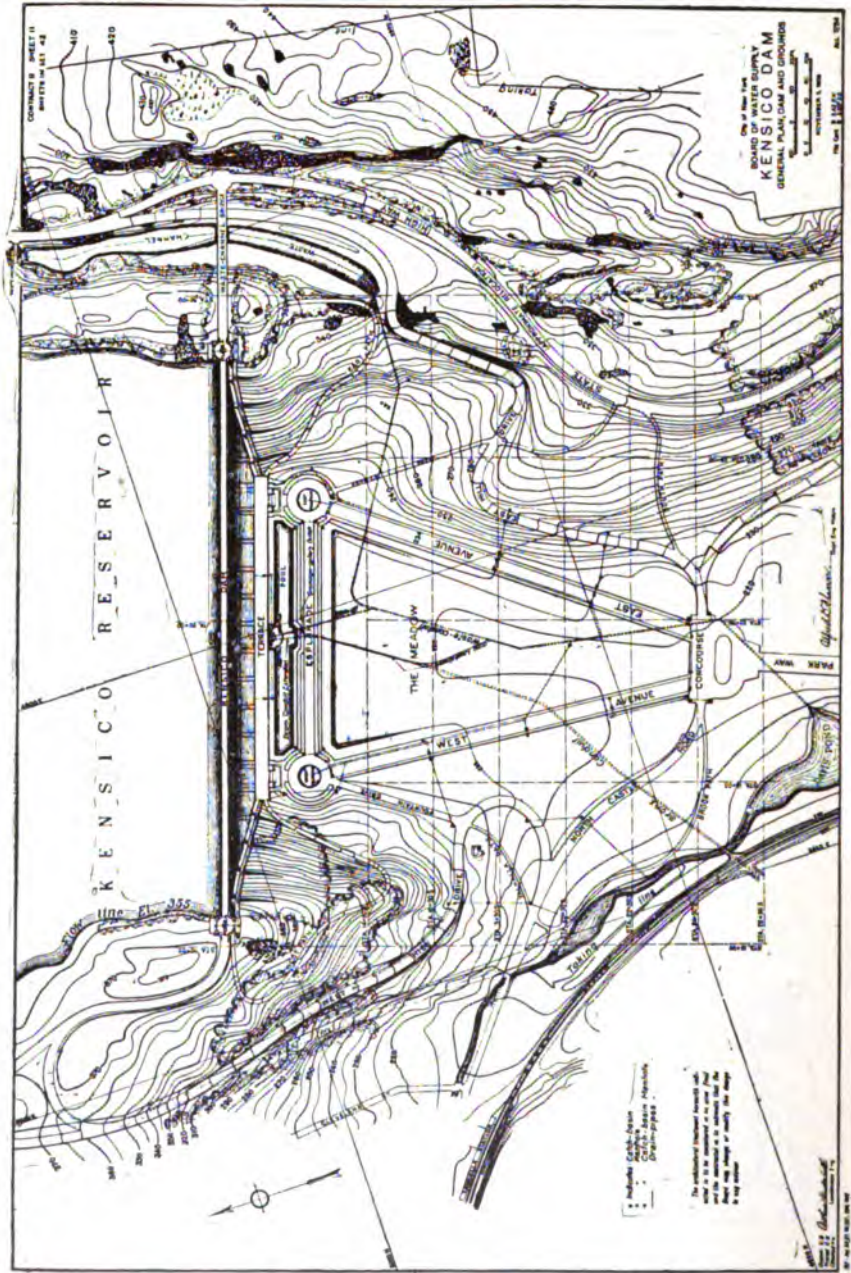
Contract 9. General Plan of Kensico Dam and Grounds.
